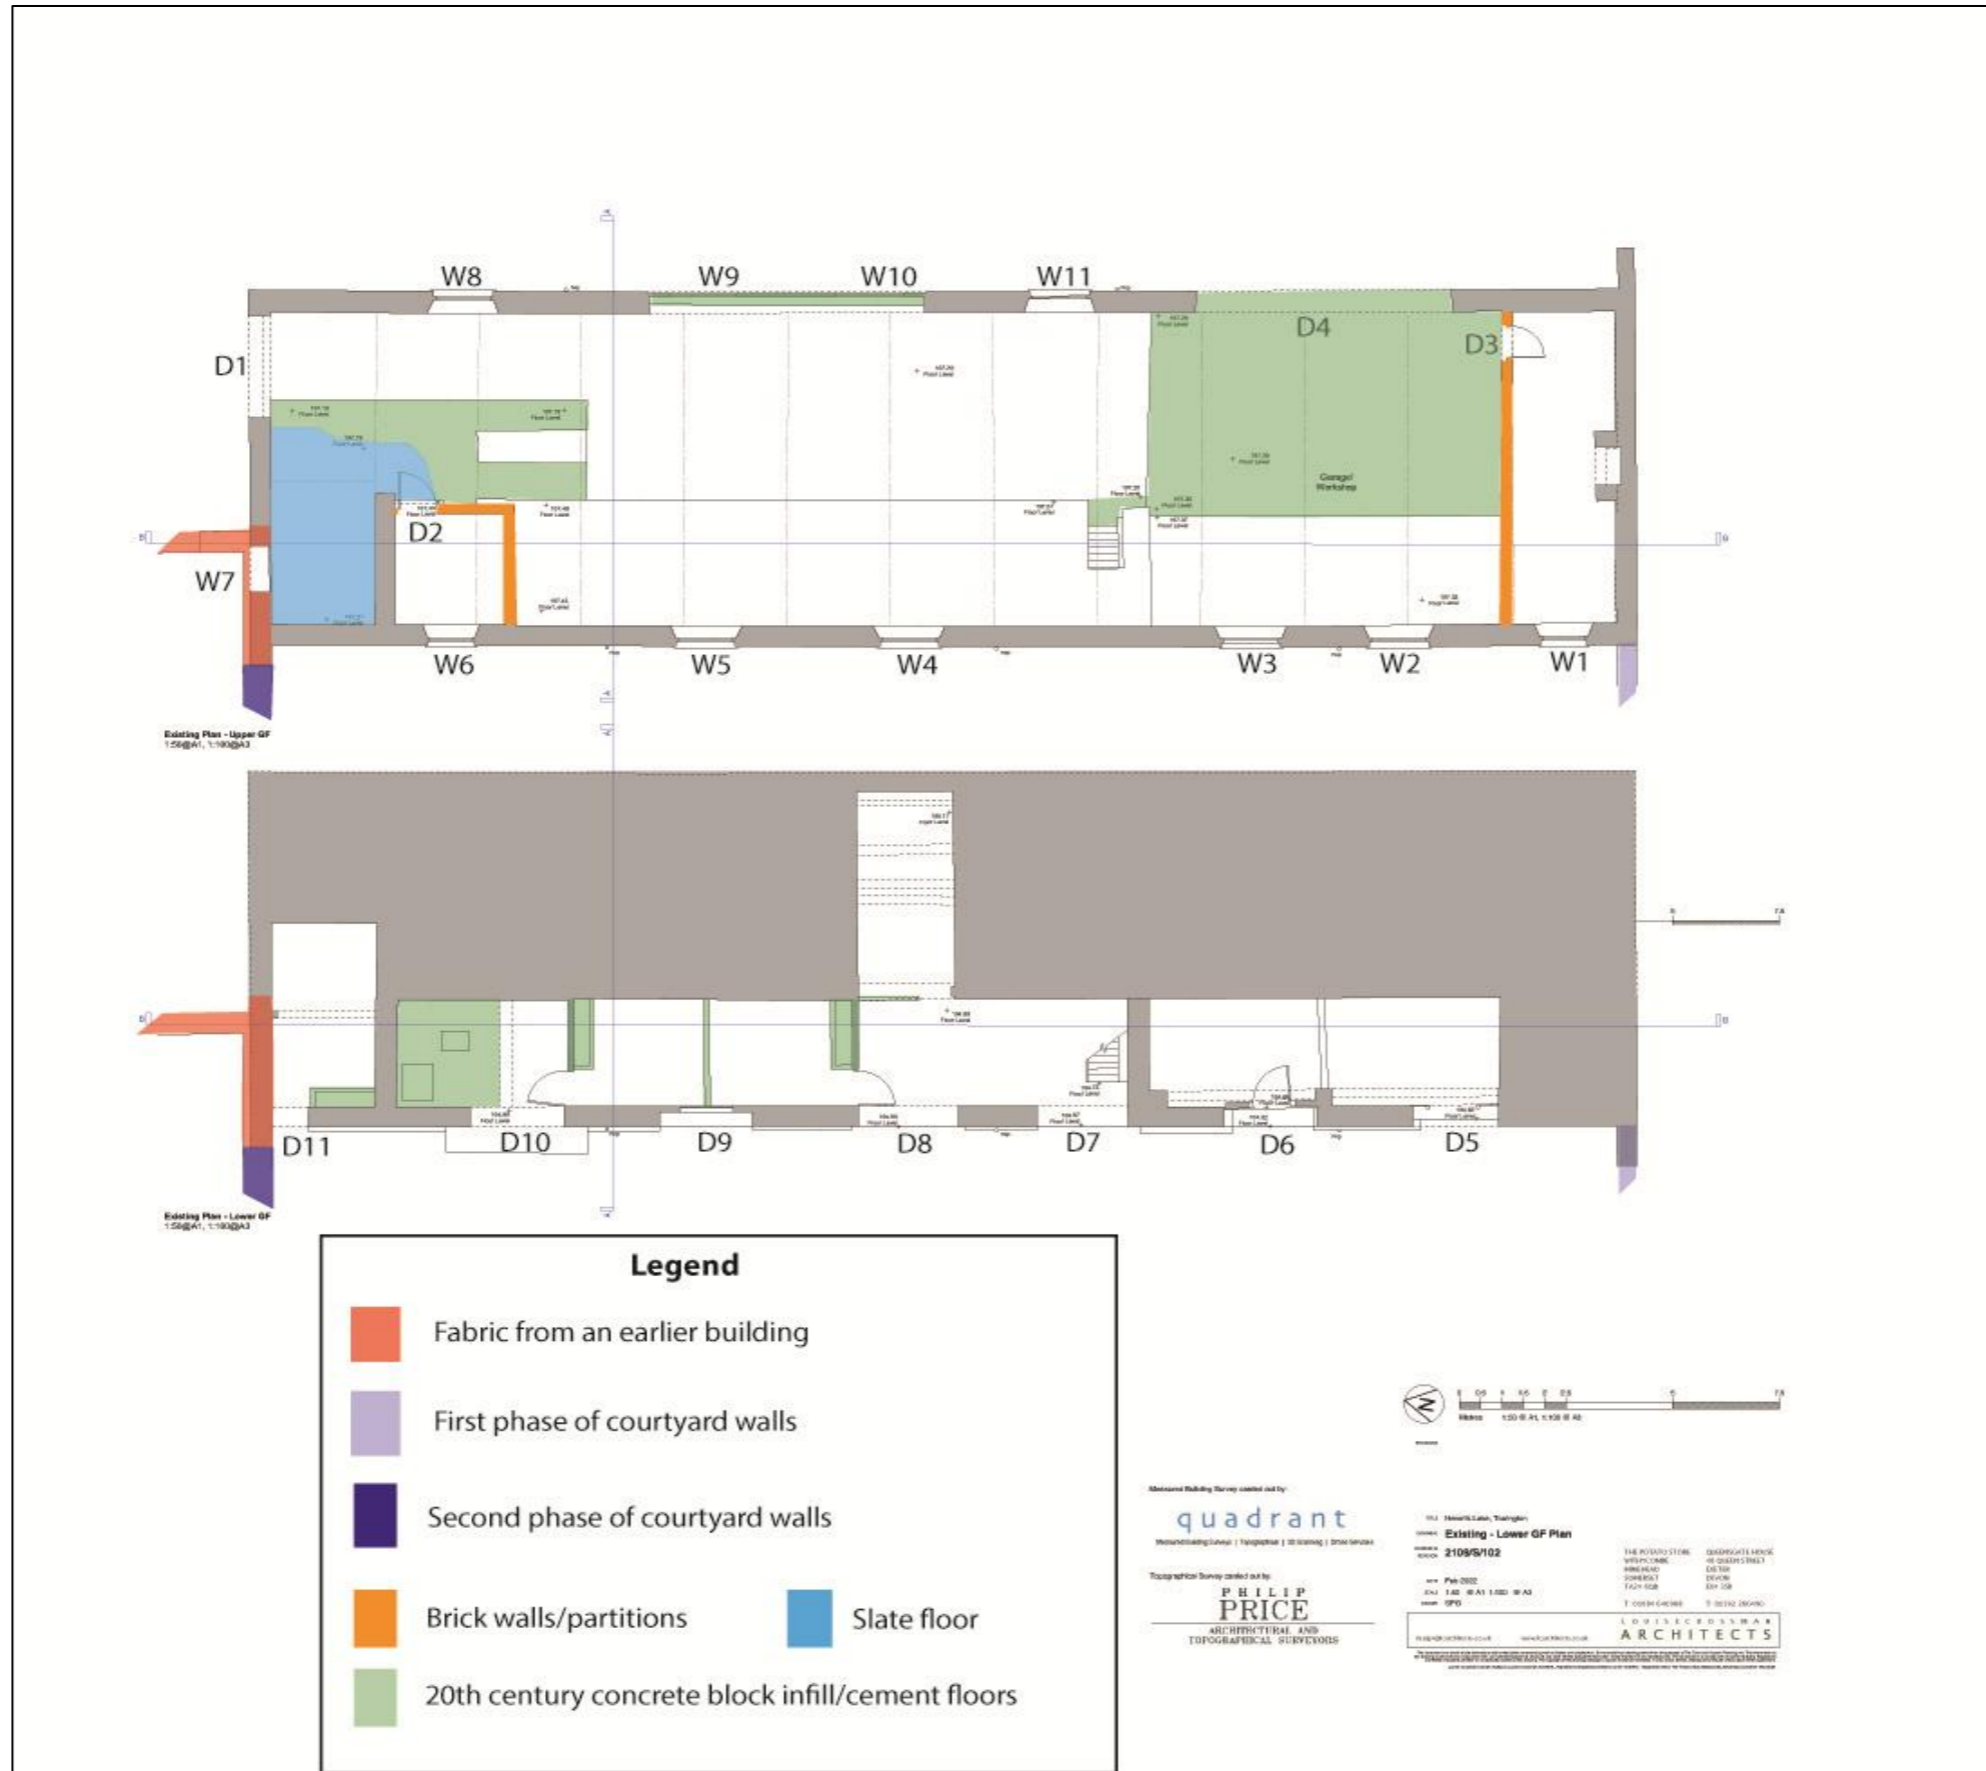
PHASED PLAN OF UPPER GROUND FLOOR.
